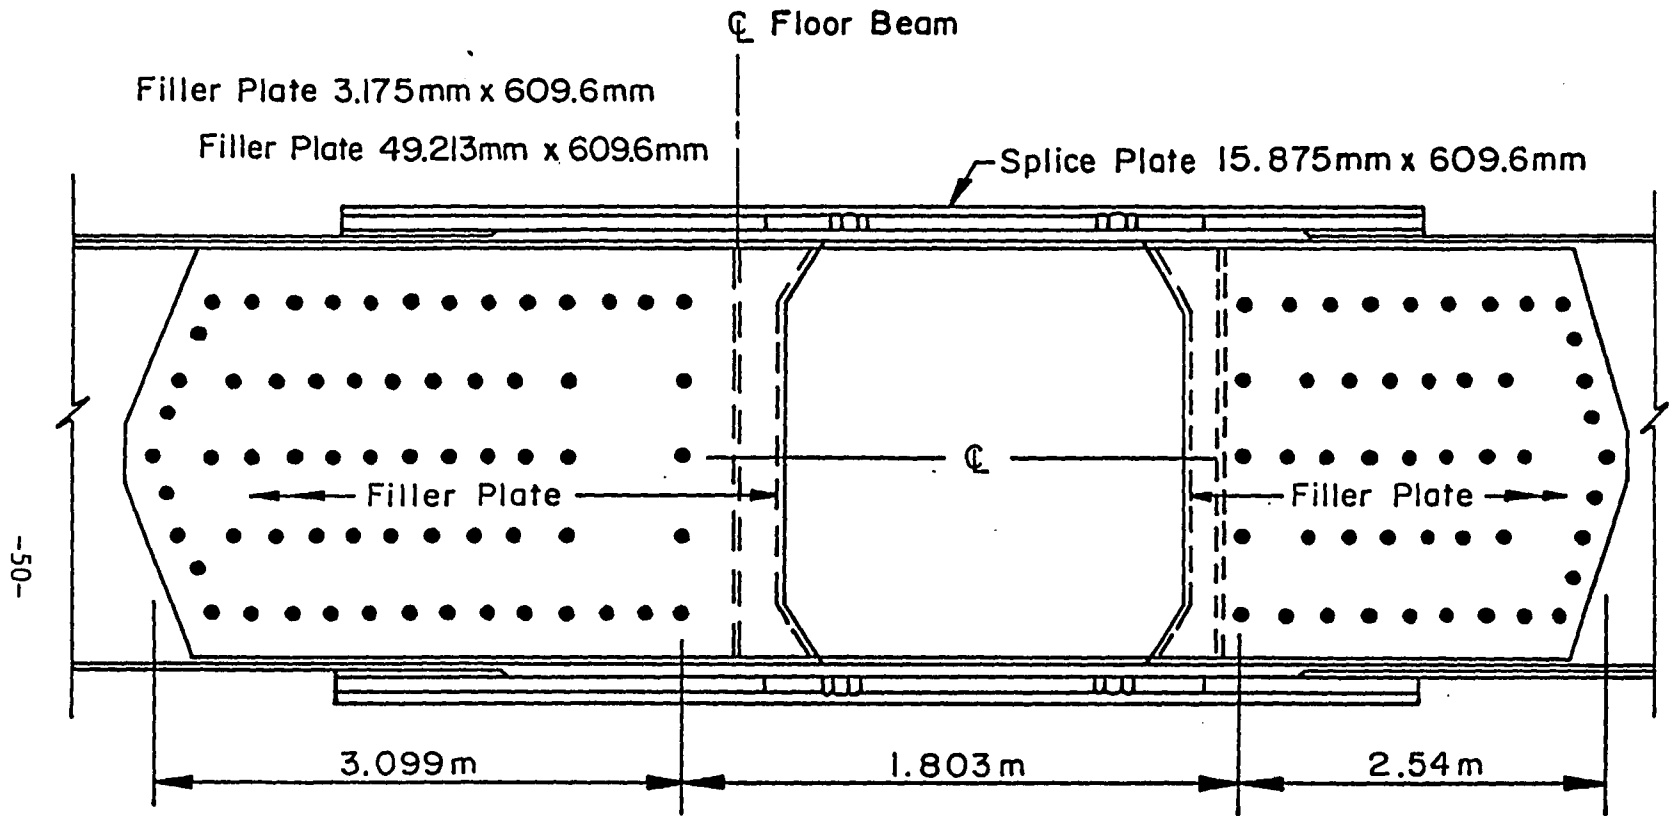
Elevation of the Typical Retrofit Detail for Spliced Panel Points of the Tie Girder
